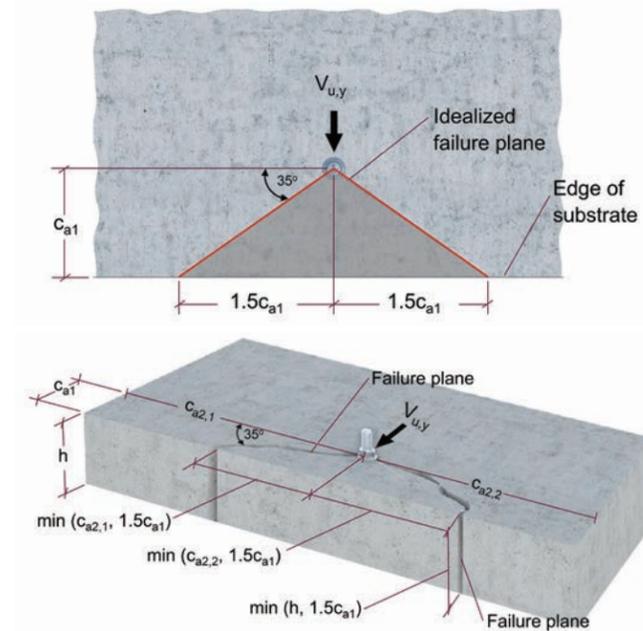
Idealized failure planes and projected area of a cast-in anchor in accordance with ACI 318-14.
